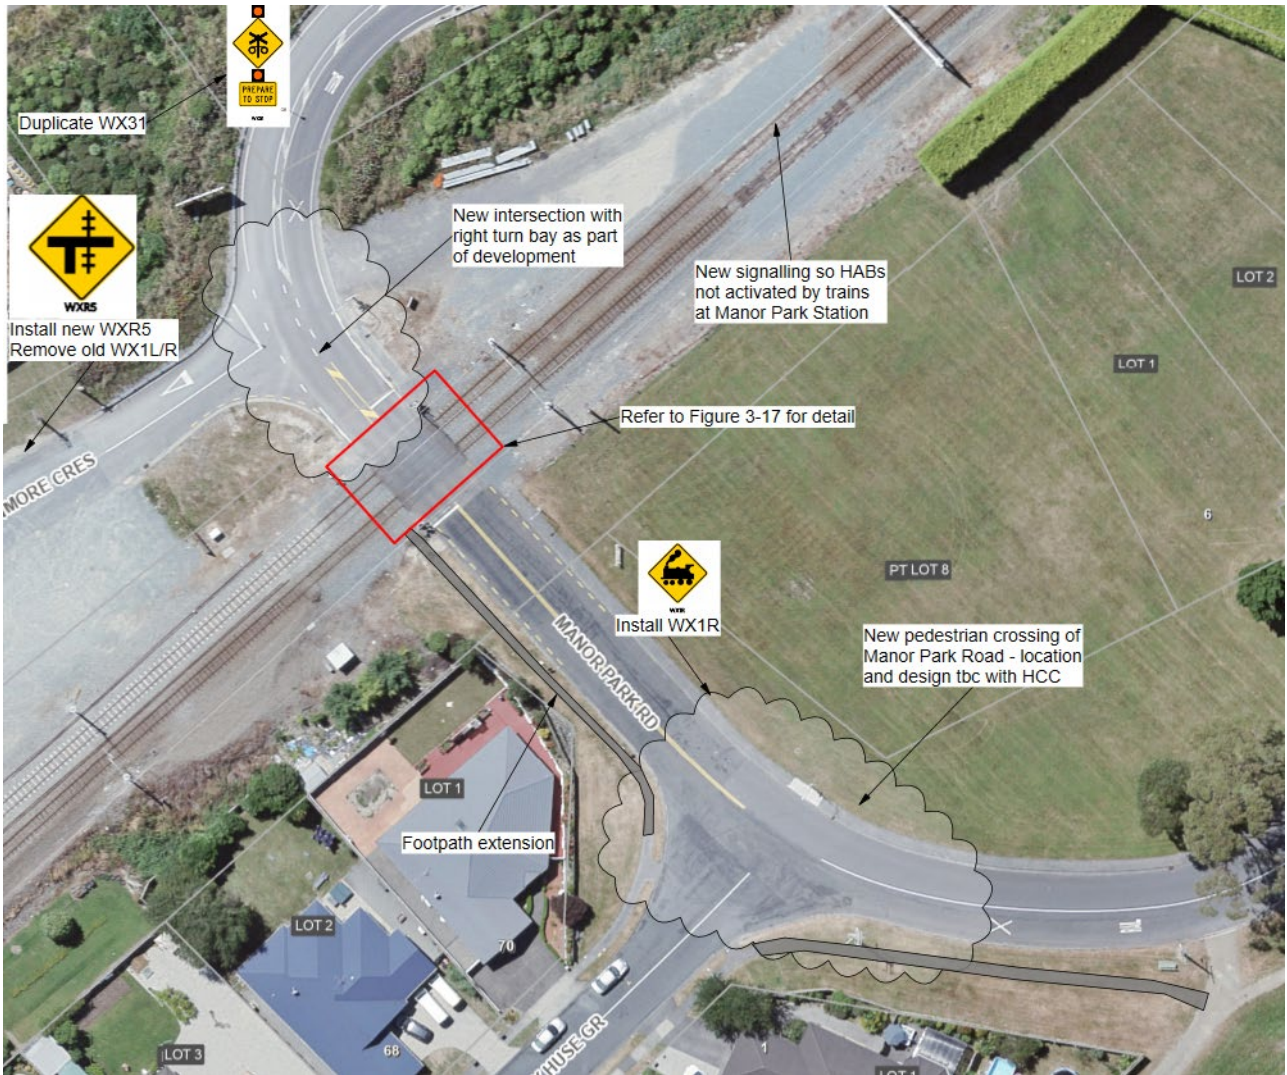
Recommendations for the Manor Park Road Level Crossing
